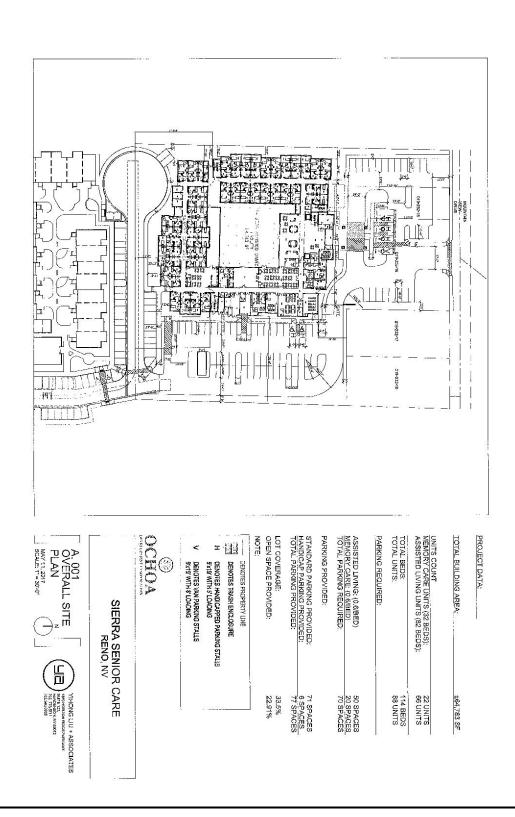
32 BED MEMORY CARE/82 BED ASSISTED LIVING SITE PLAN
